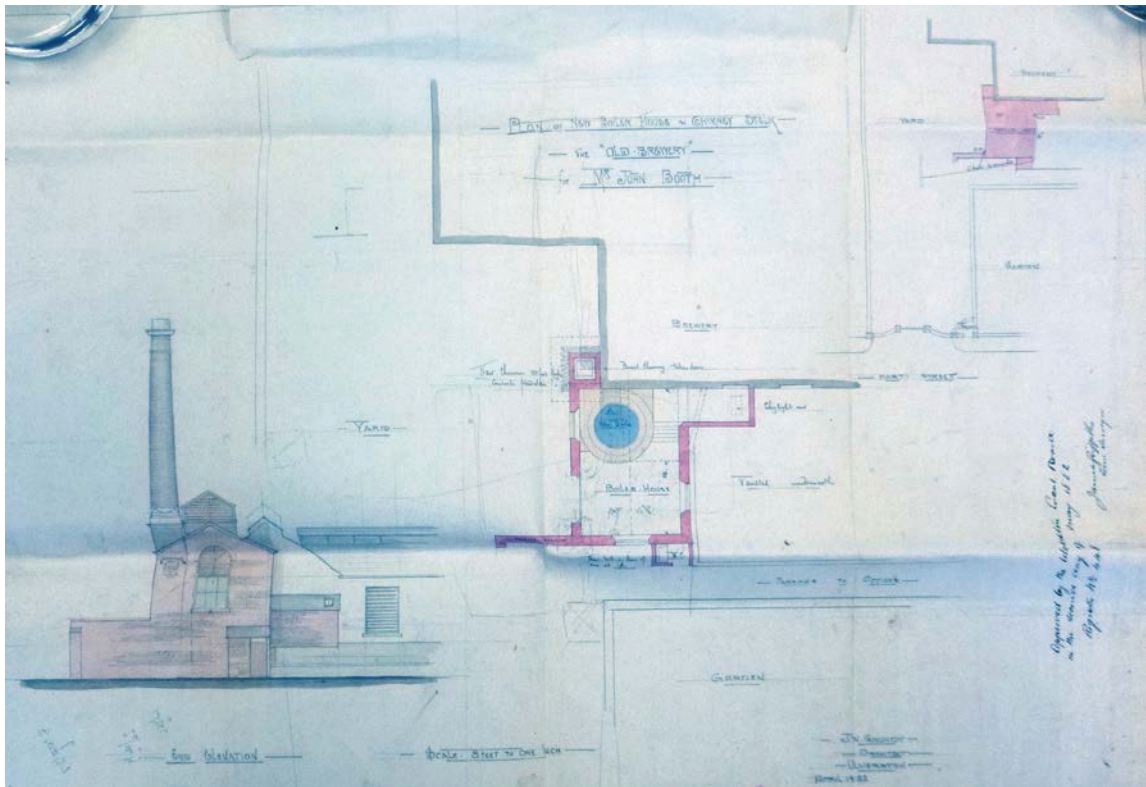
Plan of new boiler house and chimney stalk [sic], the Old Brewery, 1882
